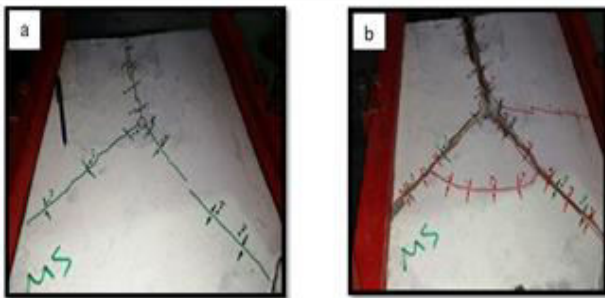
Crack pattern of micro steel fibre: a) initial crack of simply support. b) final crack of simply support.
